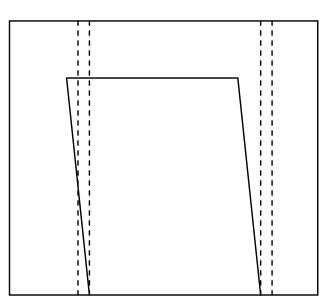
Proper track alignment when door frame is out of square. (Not shown to scale.)
